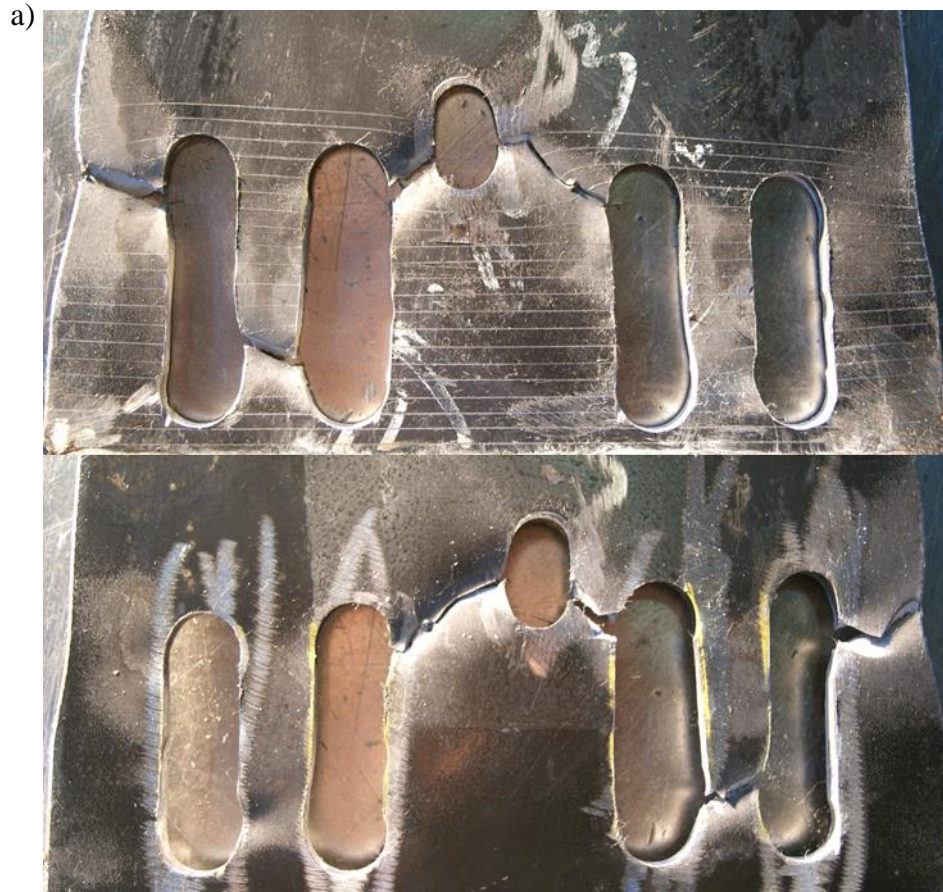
Specimen No. 3 - Observed behaviour of gusset plate in the region with slotted holes after test: a) gusset plate at bottom; b) gusset plate at top
